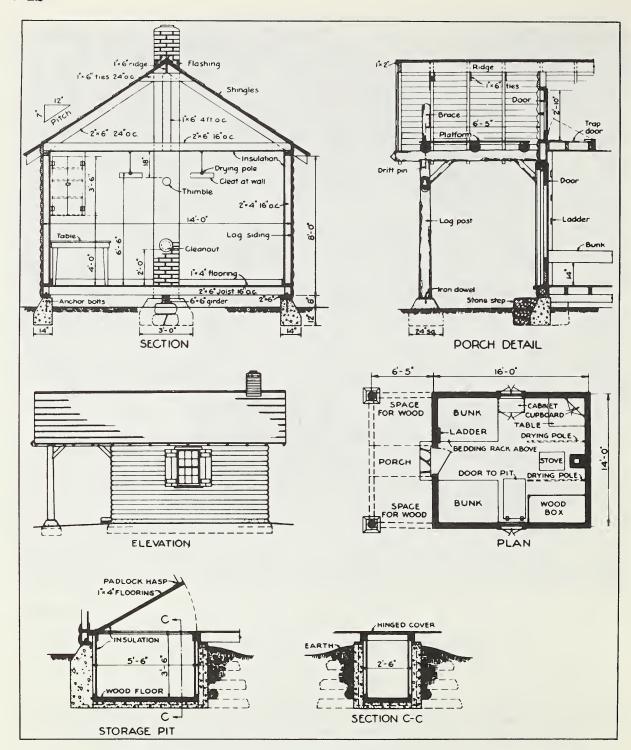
Plan, elevation, and section of Colorado-type shelter cabin,
